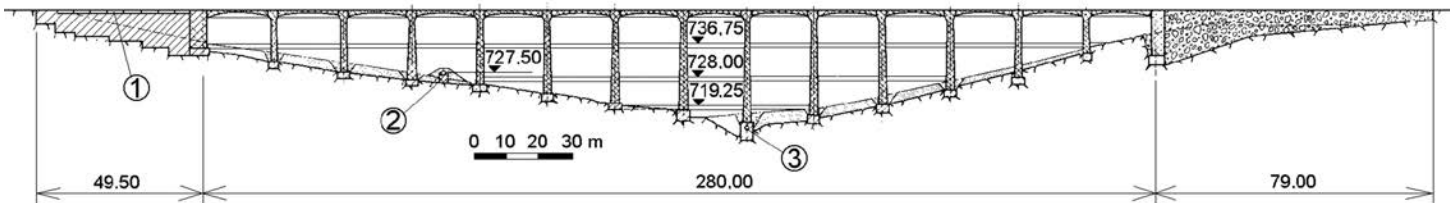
Prilep Dam, longitudinal section. (1) Overflow; (2) Intake; (3) Bottom outlet.
